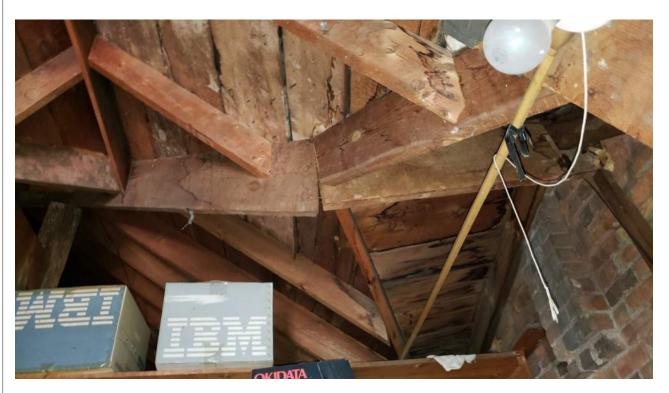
Roof framing west of stair tower showing water infiltration and connection failure
